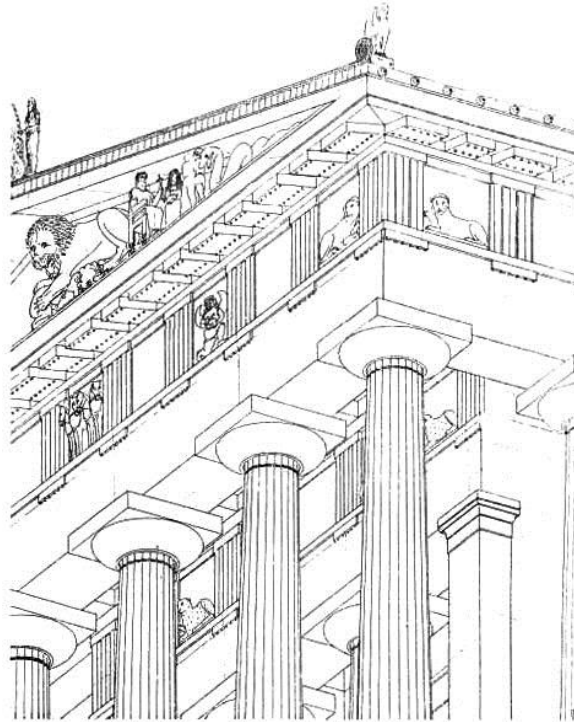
Isometric drawing of the corner of “Building H”, Athens.
